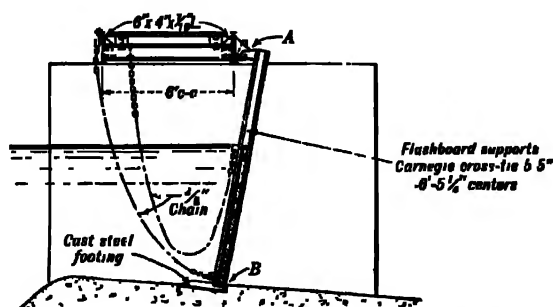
Details of flashboard device, Davis Bridge Spillway. (E. A. Dow at Spring Meeting, A.S.M.E., 1925)
